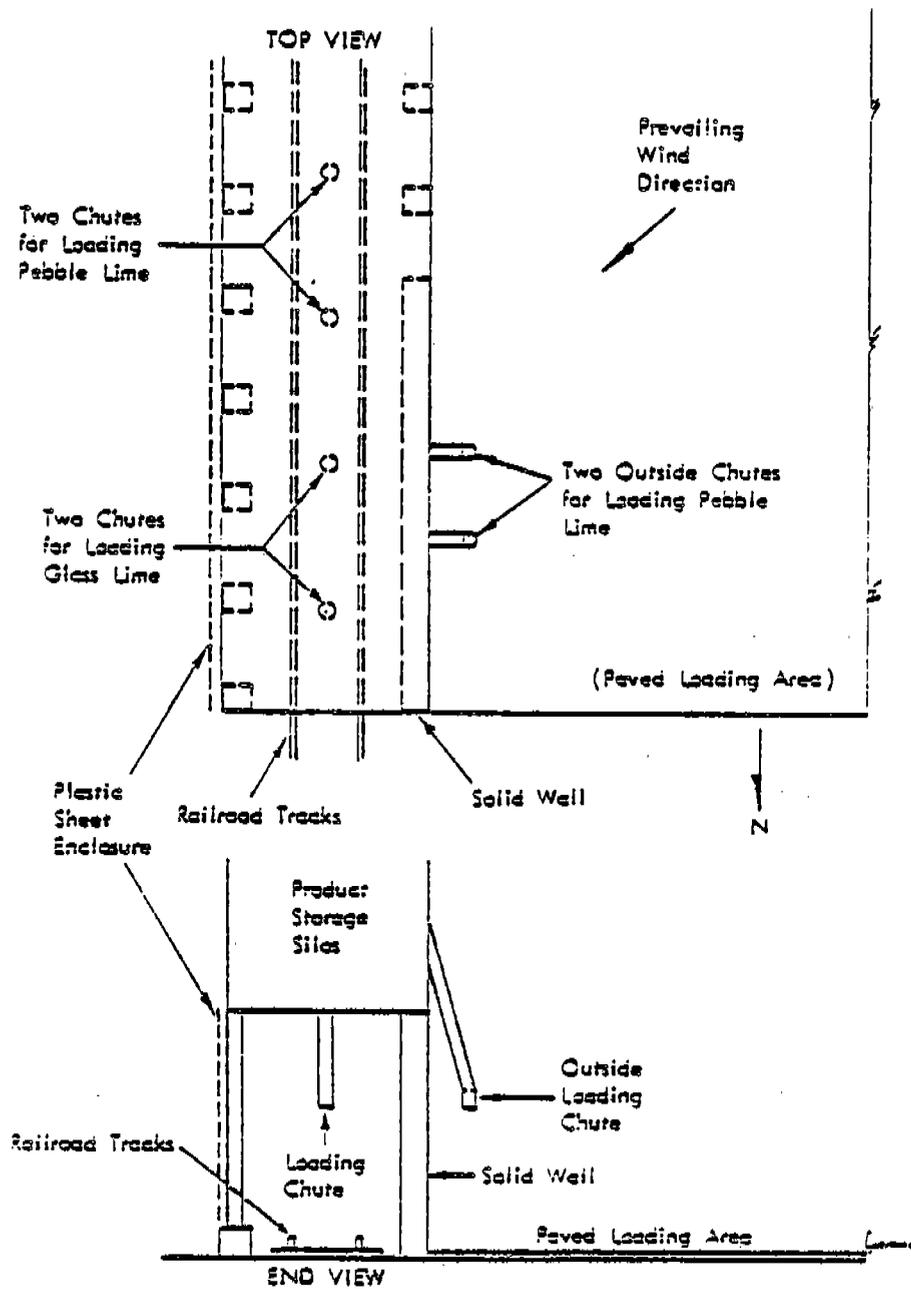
Product loading bay for trucks and railcars and finished lime product storage building, Pfizer plant.
